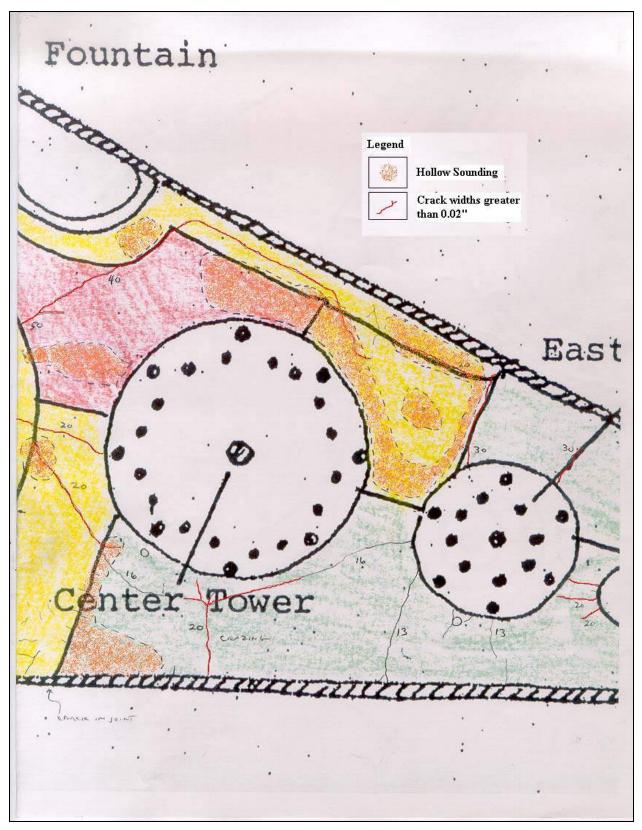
Section B --Westerly center section of property (Center and East Towers)
